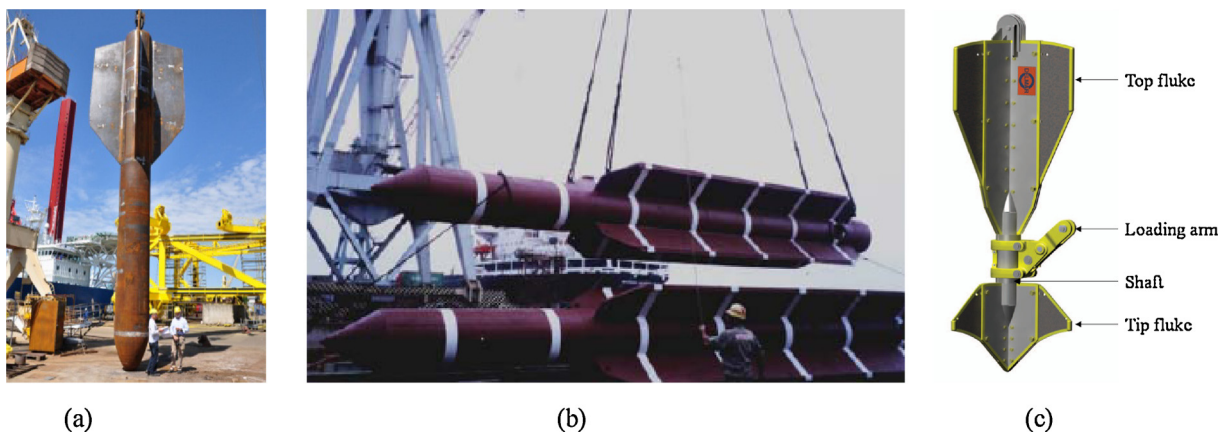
Dynamically installed anchors: (a) DPA (Deep Sea Anchors, www.deepseanchors.com); (b) torpedo anchor (after de Araujo et al. [14]); (c) OMNI-Max anchor (www.delmarus.com).
